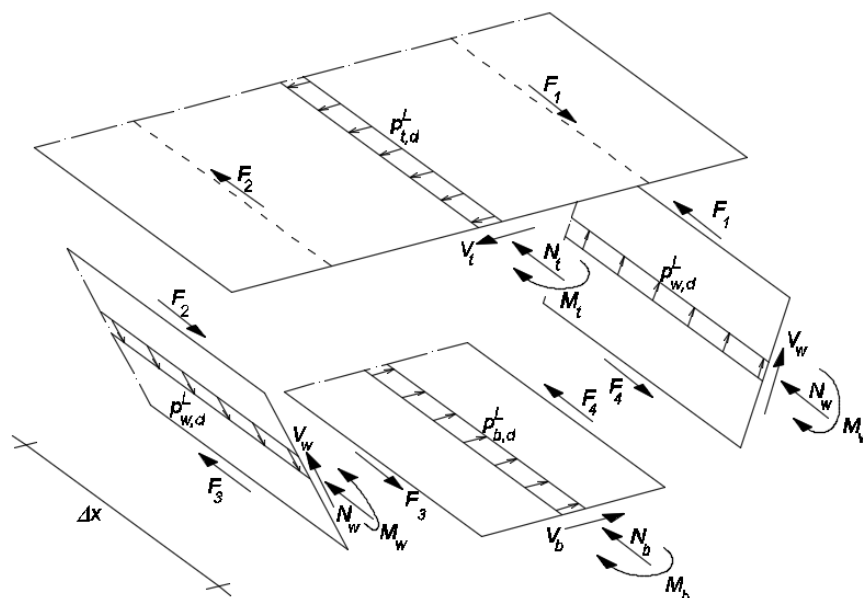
Forces and moments acting on the plates of a segment of box girder bridge subjected to distortion
